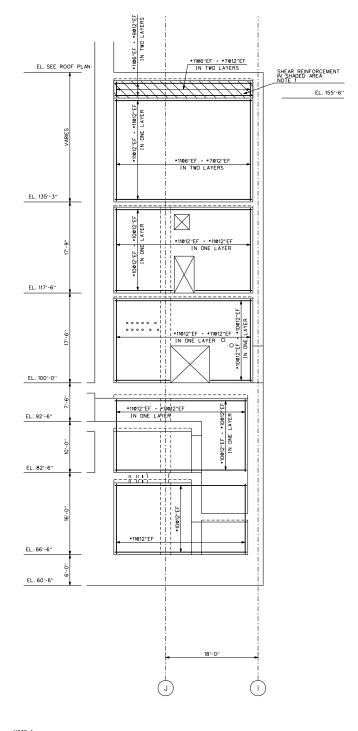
H.5-4 [Typical Reinforcement in Wall 7.3]
